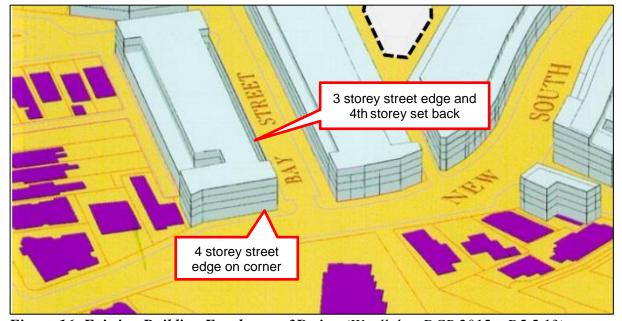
Existing Building Envelopes – 3D view (Woollahra DCP 2015 – D5.5.13)
